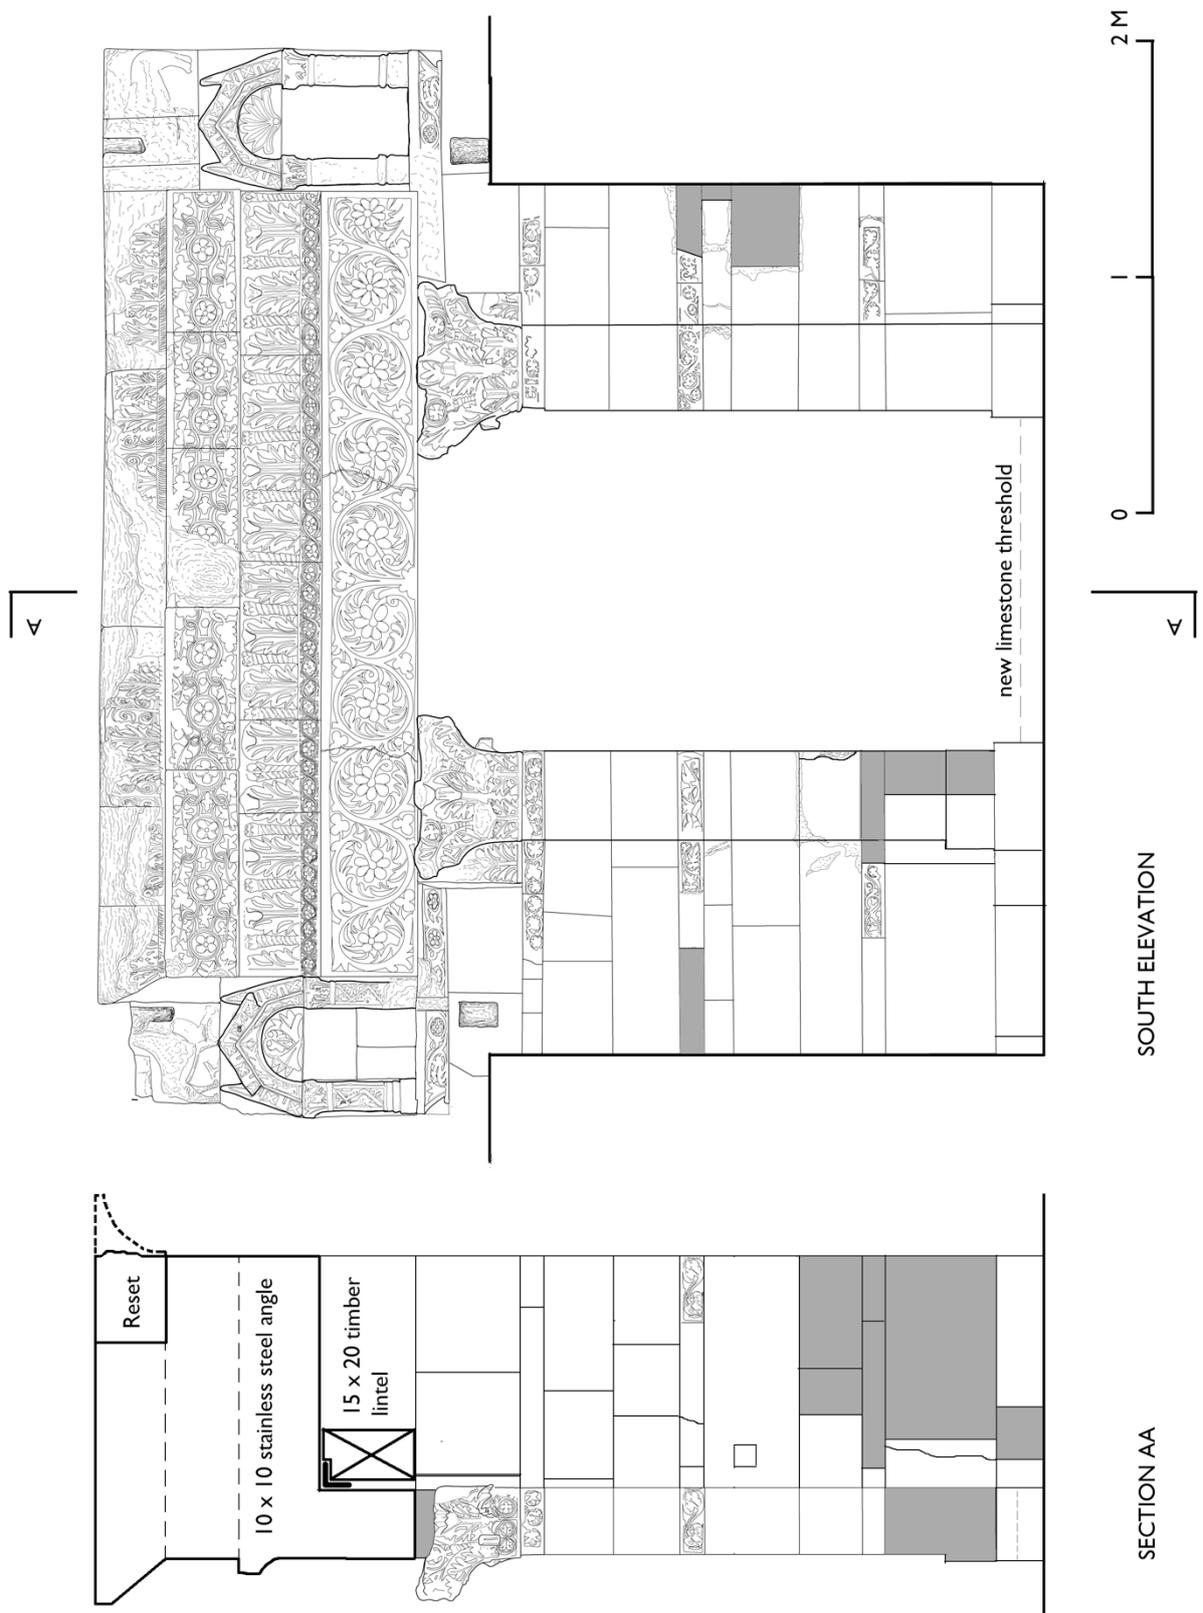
South Portal elevation and section showing ashlar block replacements
